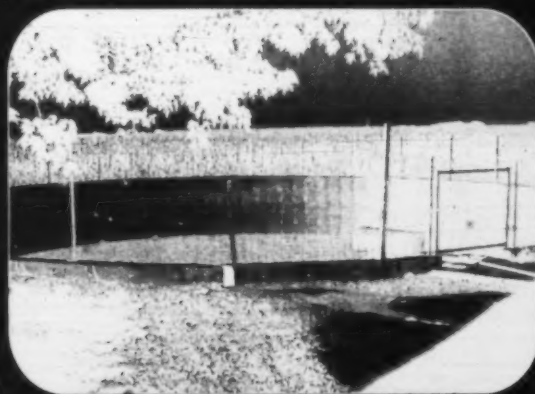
A reinforced concrete manure storage structure built to contain all waste nutrients from a livestock enterprise.
